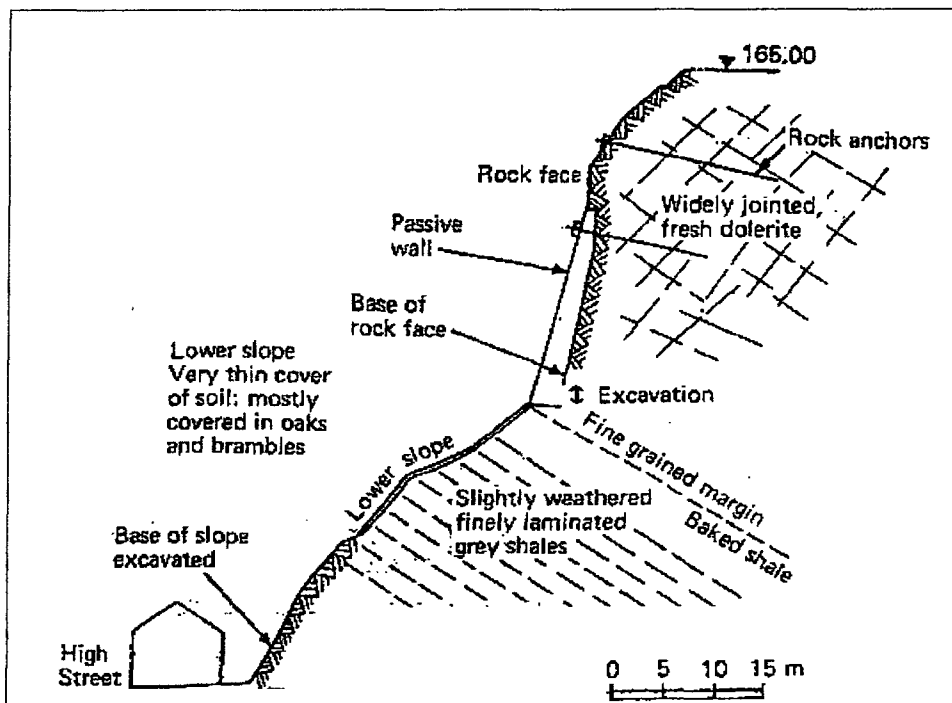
The Eastern section of the slope at Craig y Dref.
